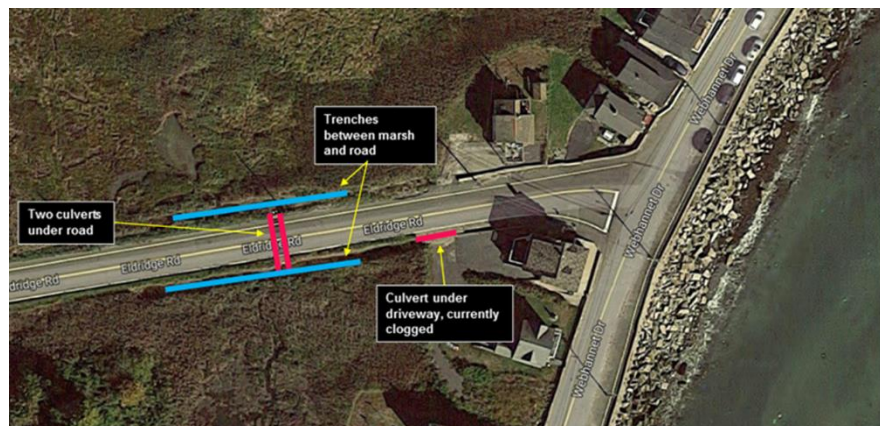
Current Culvert Locations on Eldridge Road (Google Maps)
